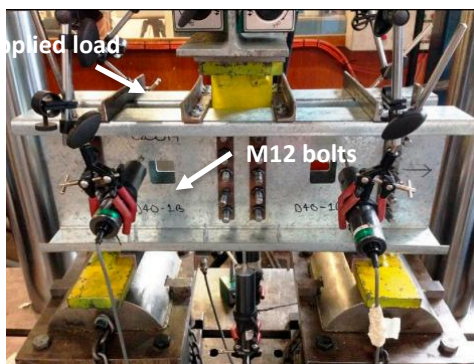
Experimental arrangement used for testing CFS channel sections containing web openings.
